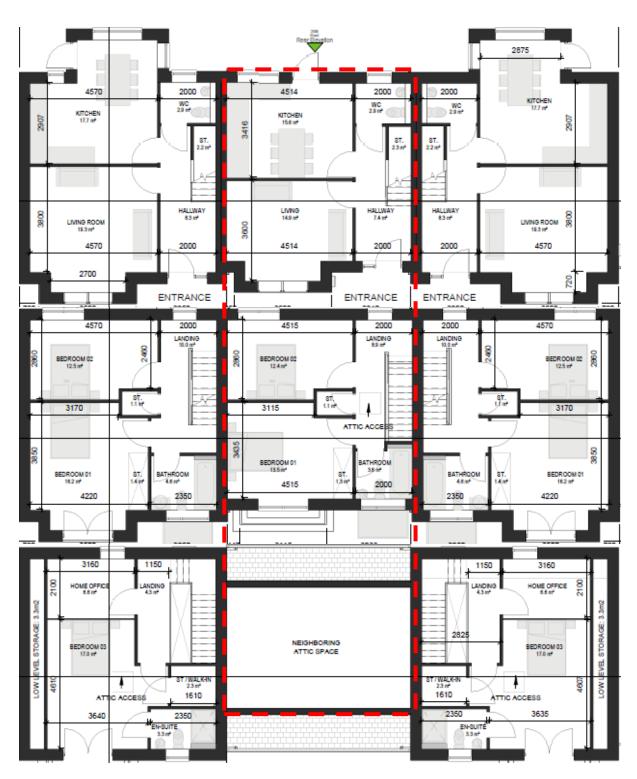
Typical ground floor plan of House Types 6.1 & 6.3 (top), typical first floor plan of House Types 6.1 & 6.3 (centre) and typical second floor plan of House Type 6.3 & 6.3 (bottom). The area within the red dashed line represents the ground and first floor plans for House Type 6.2.
